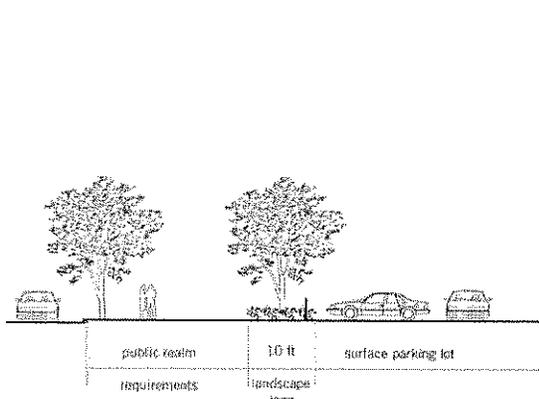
District Framework Plan - Public Realm Requirements
